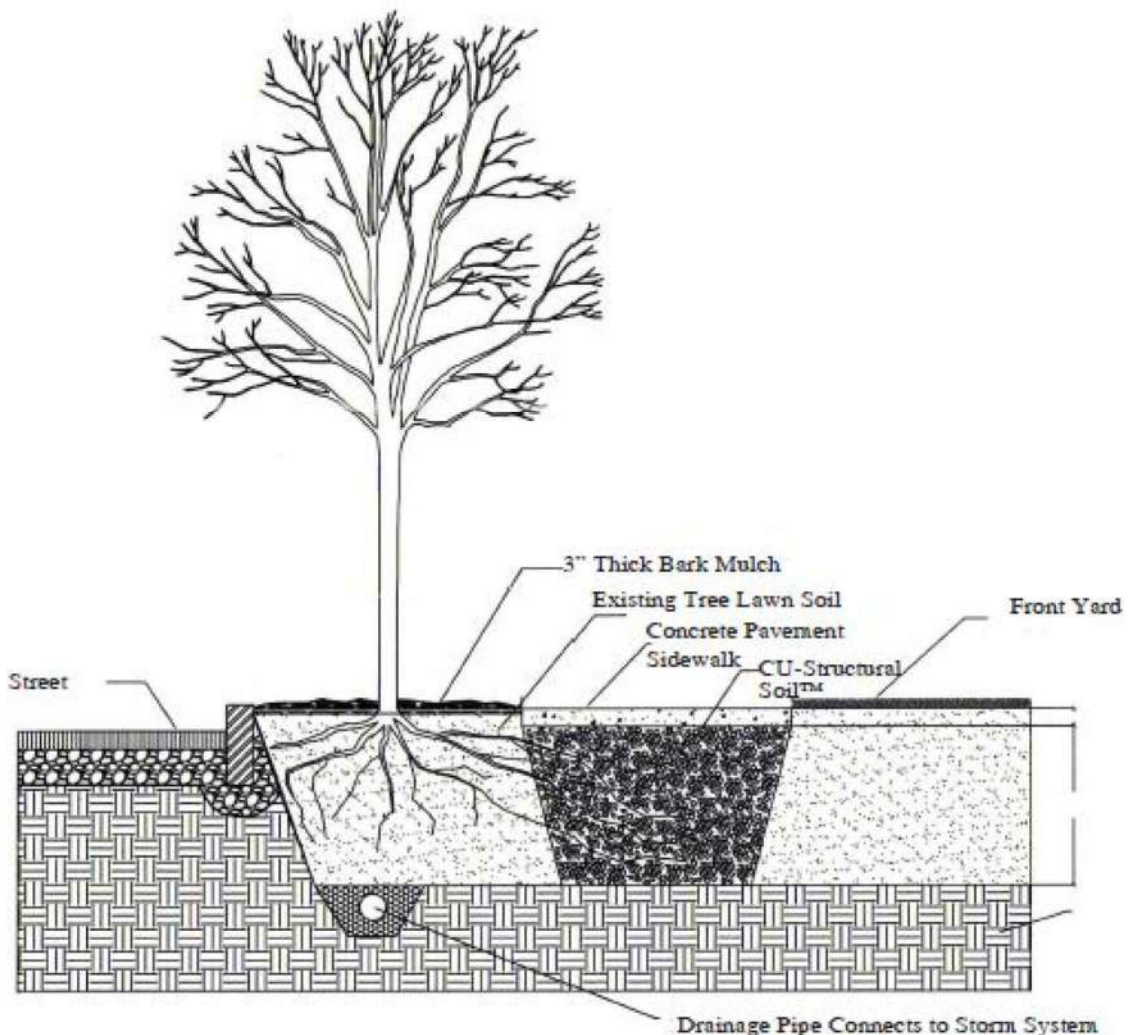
CU-Structural Soil™ break-out zone from narrow tree lawn to adjacent landscape area
